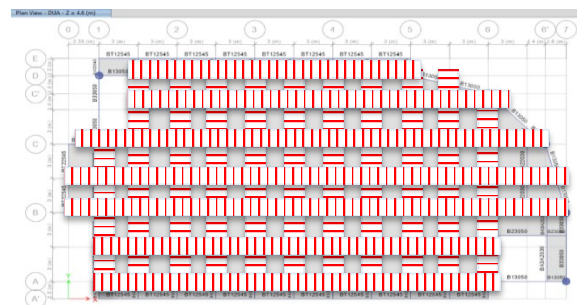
Installation of FRP retrofitting of the focus of the second floor slab
